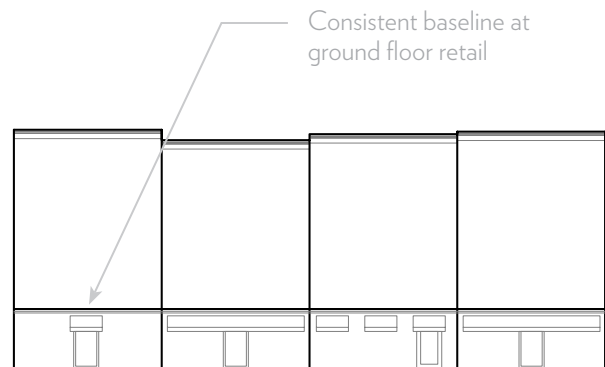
Local retail within multi-story buildings can have a horizontal datum defining the ground floor level.
